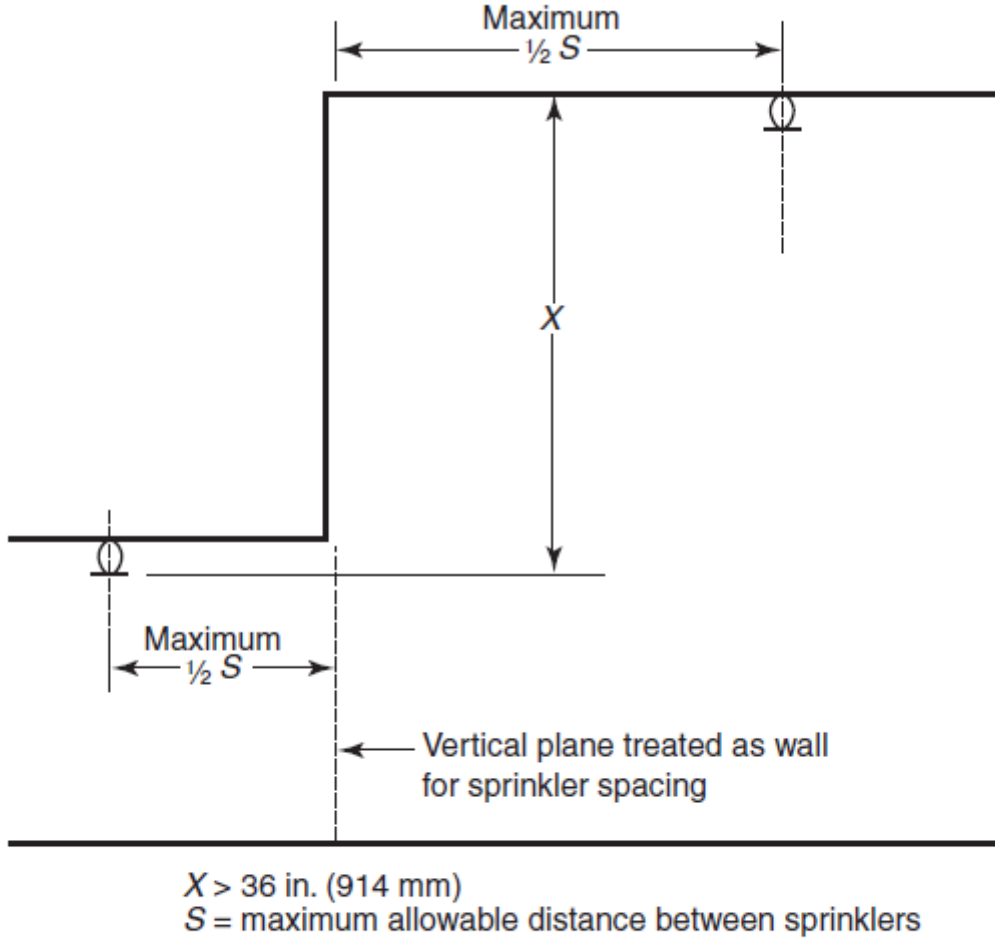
(B) Vertical Change in Ceiling Elevation Greater Than 36 in. (914 mm).
